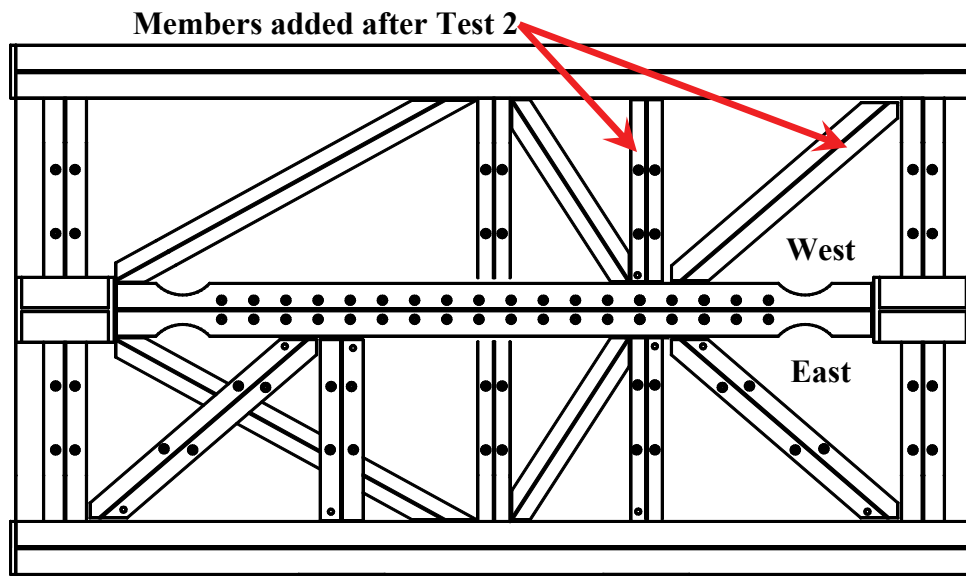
Layout of the Intermediate Floor Truss Strengthened after Test 1
